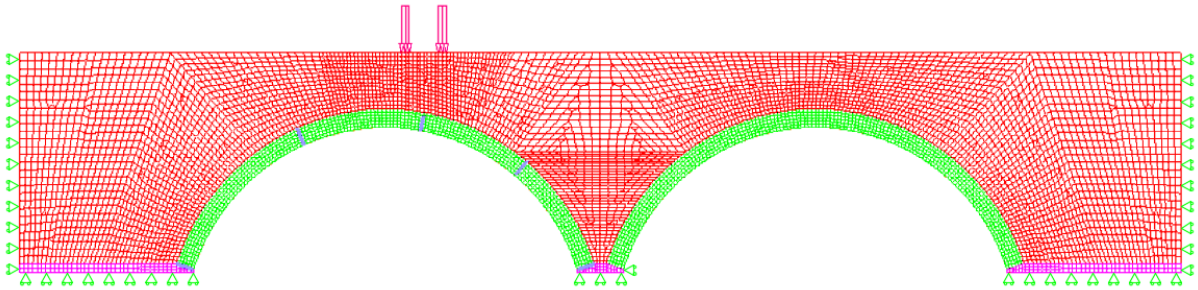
ADINA hinge locations, TL loading, and boundary conditions
